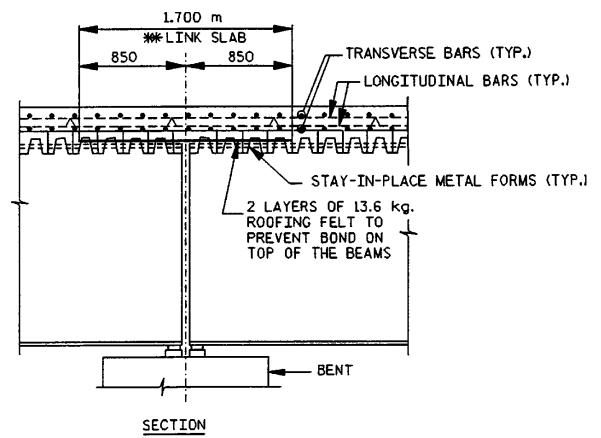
Florida continuous deck detail plan, 5A1 and 5A3 bars are #5 bars, and they run parallel to girders (from Robertson, 2009)
